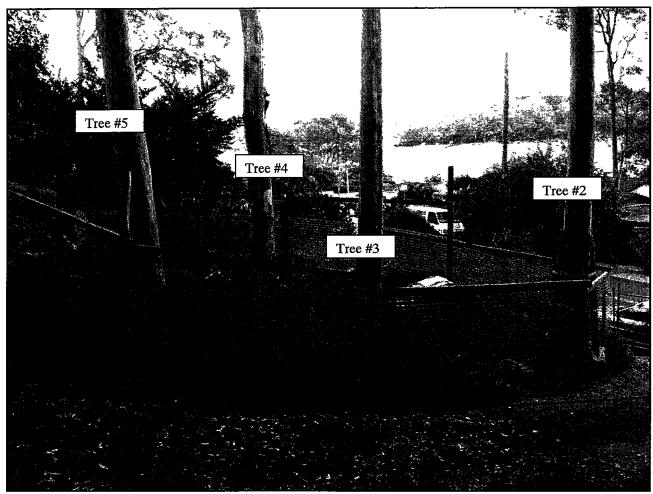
Illustrates TPZ installation, note "Tree Guard" installed around trunk of Tree #2
